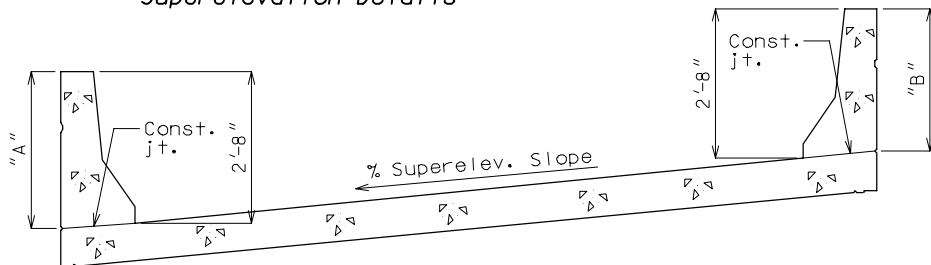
Section Thru Superlevated Slab
